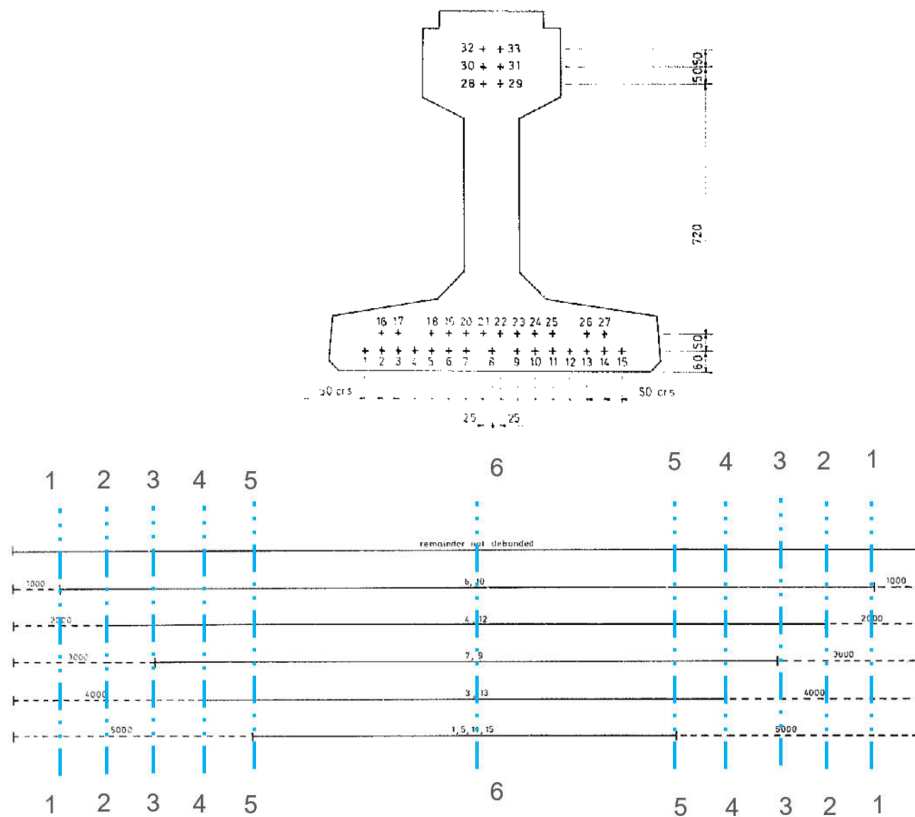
M-6 Beam Strand Layout and Debonding Details
